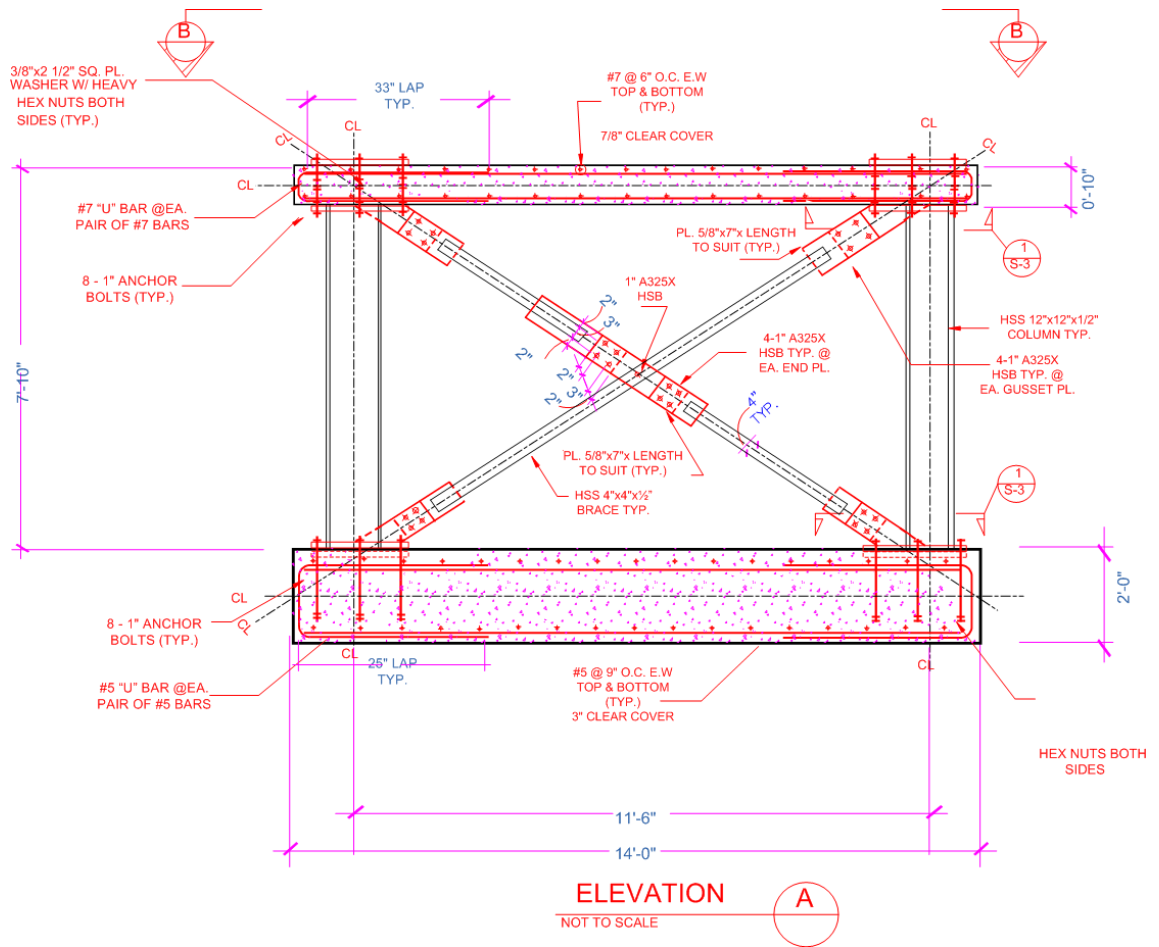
Construction plan cross-section of the test structure Mini-Me.
